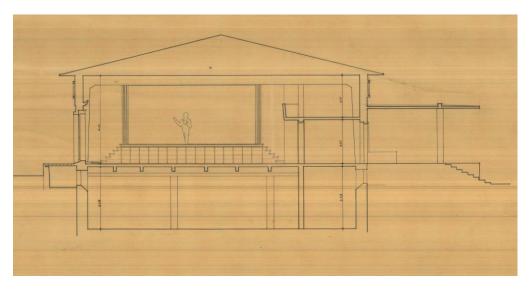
Proposal of an additional building on the north of the workers club, the section, Construction Section in General Directorate of TEKEL, 24.06.1947 (Source: TTA Archive)
